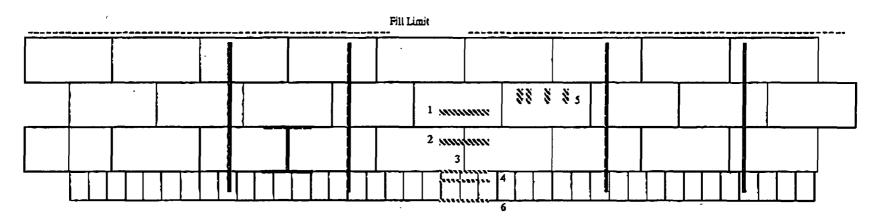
Unwrapped Surface of a Typical Type III Waste Tank, Illustrating TSIP Inspection Requirements (- - -) and Planned Inspection Extent (----) at SRS.
